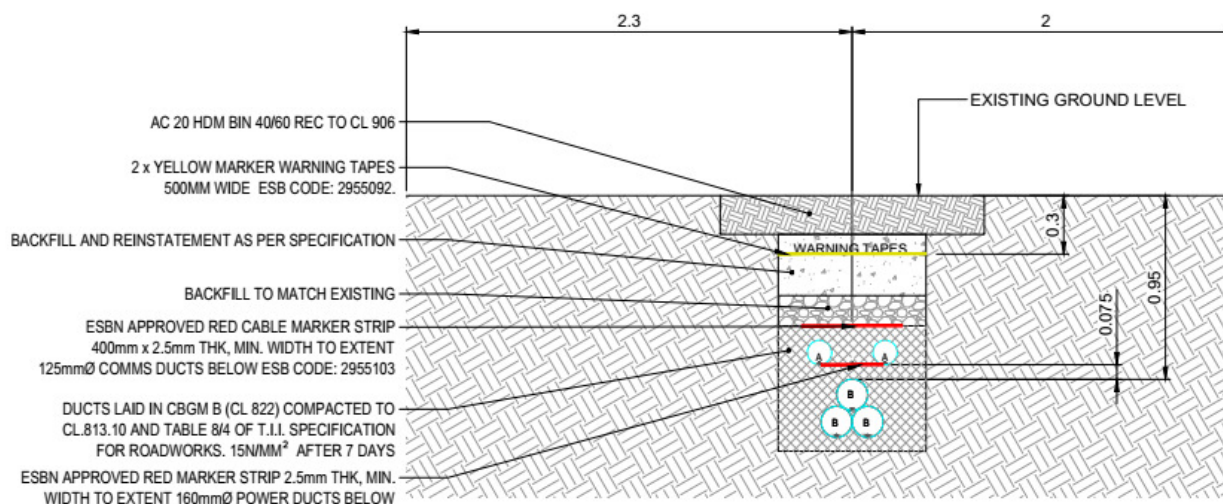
Typical cross-section of HV transmission line trench from the Kilmahud-Corkagh Circuit to the proposed Clutterland substation (Source: Drawing no. CLDHV-CSE-00-XX-DR-C-2131, CSEA Consulting Engineers)
